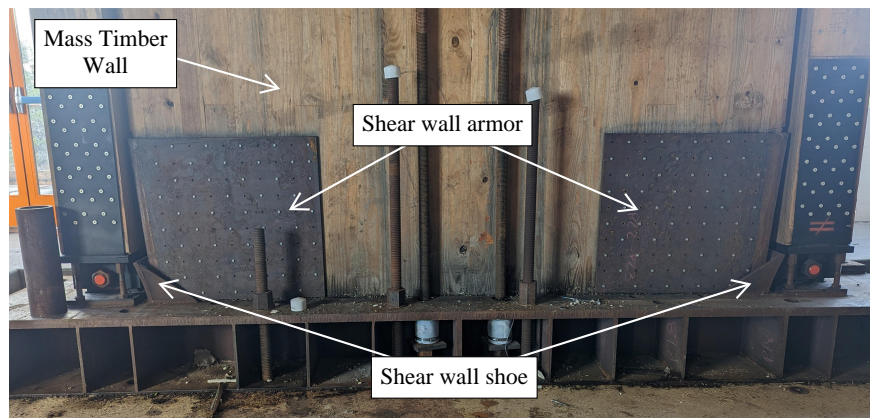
Shear shoe and wall armor detail located at the base of the post-tensioned rocking walls
